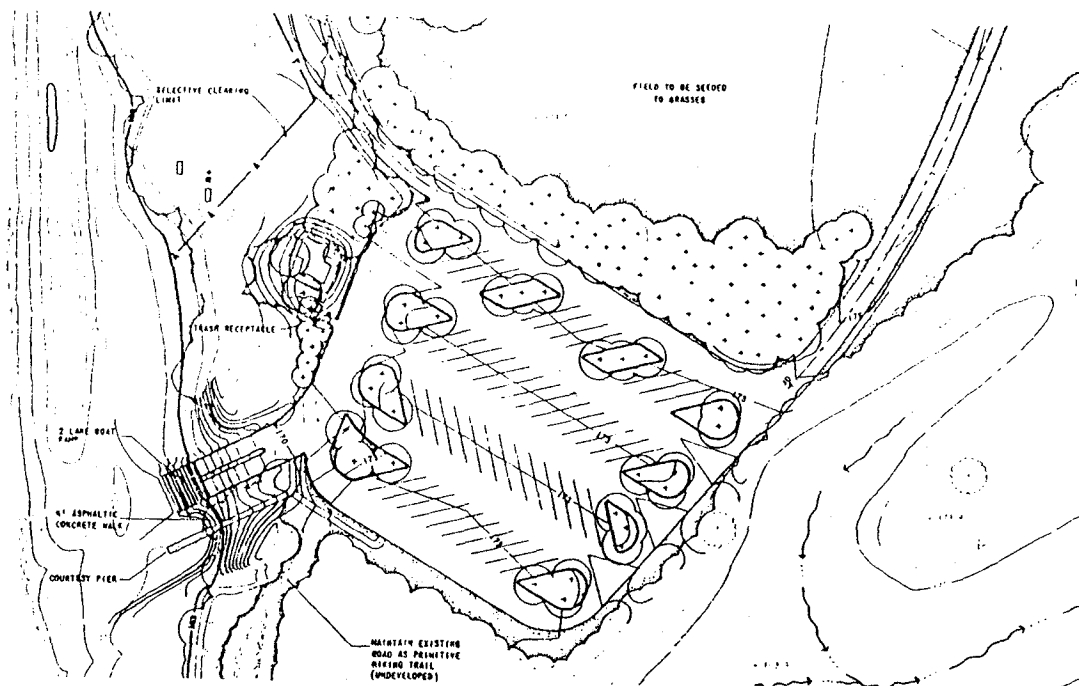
Access, Circulation, and Parking at a Boat Ramp
